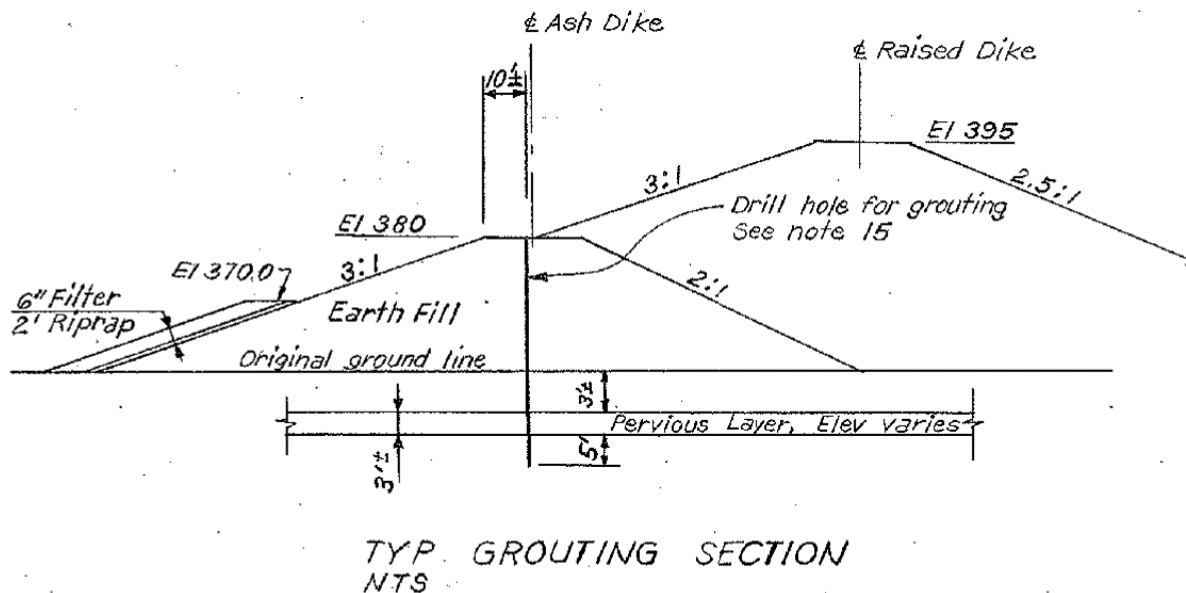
Typical Cross Section with Grout Design (TVA Drawing No. 10N213 R6)
